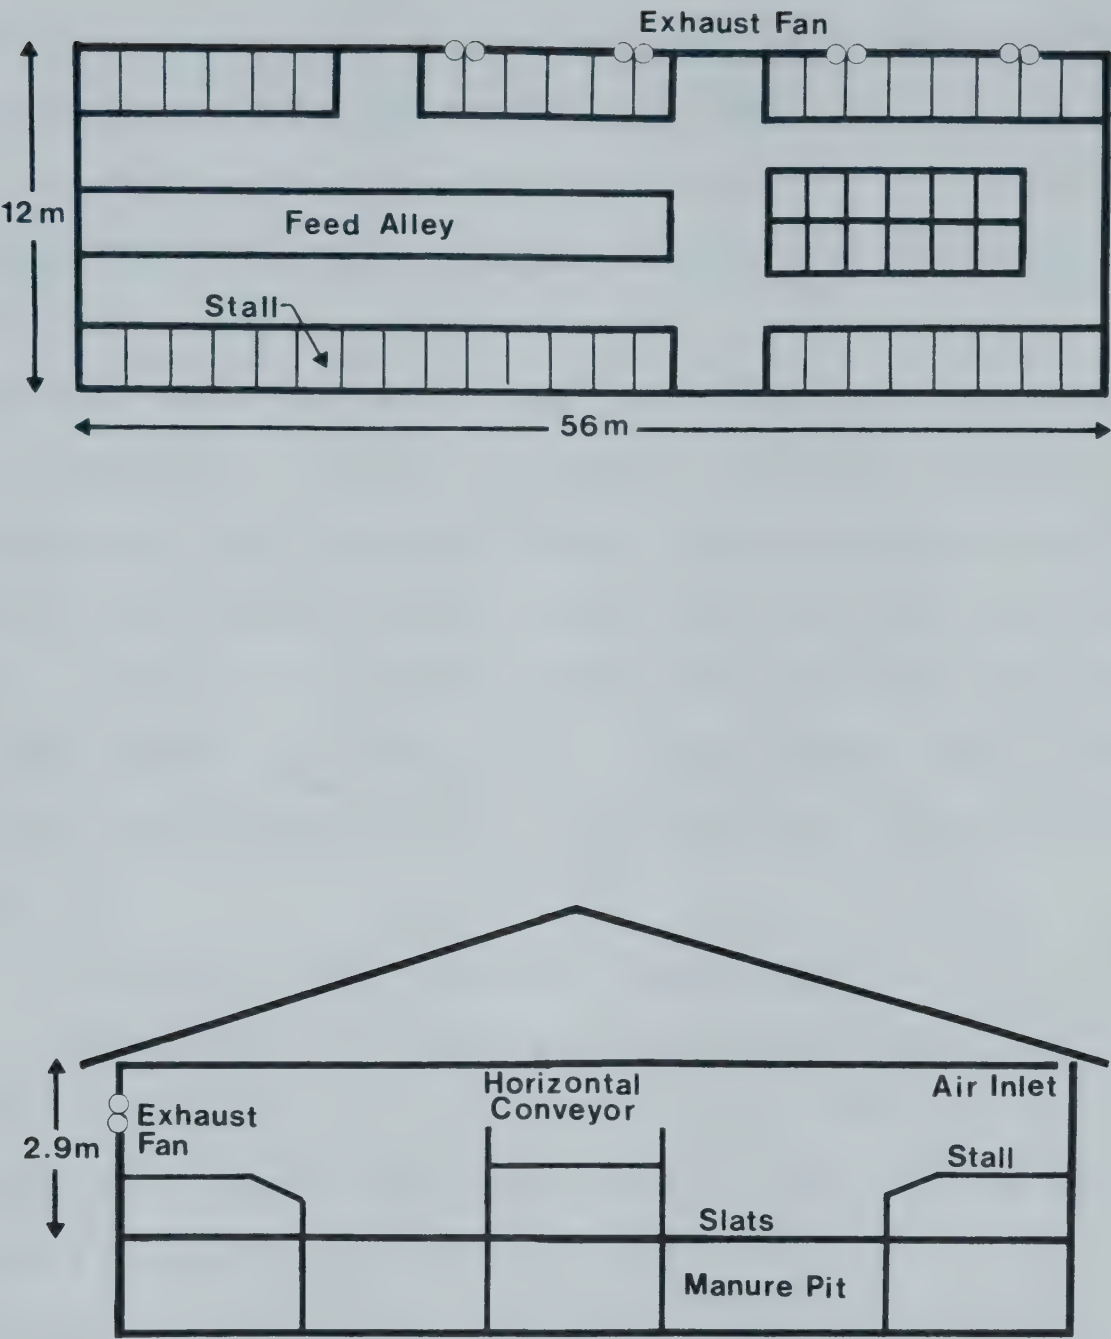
Barn SL-1 – floor plan and cross-section.
